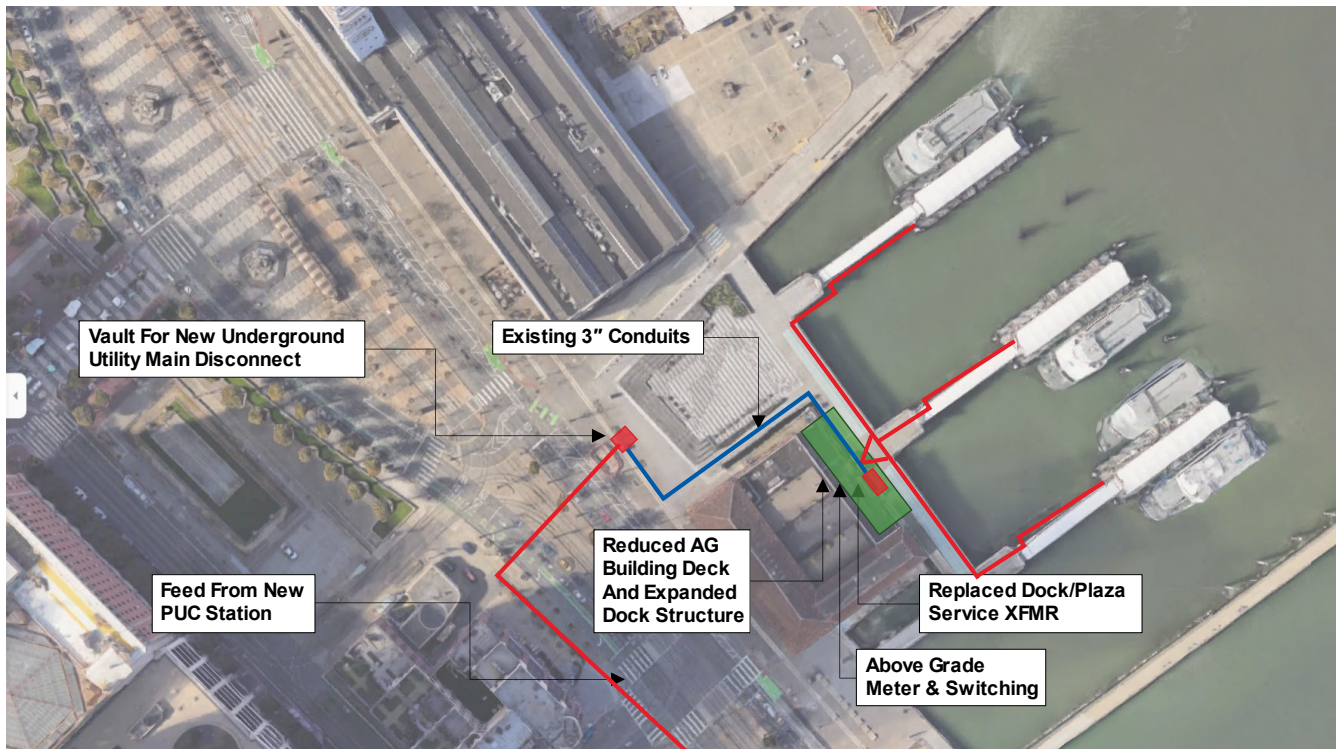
Utility Point of Connection and Switching at East of Embarcadero Credit: Arup
